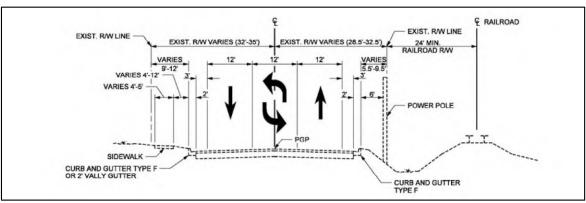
Existing Typical Section (Merry Road to Eudora Road)
